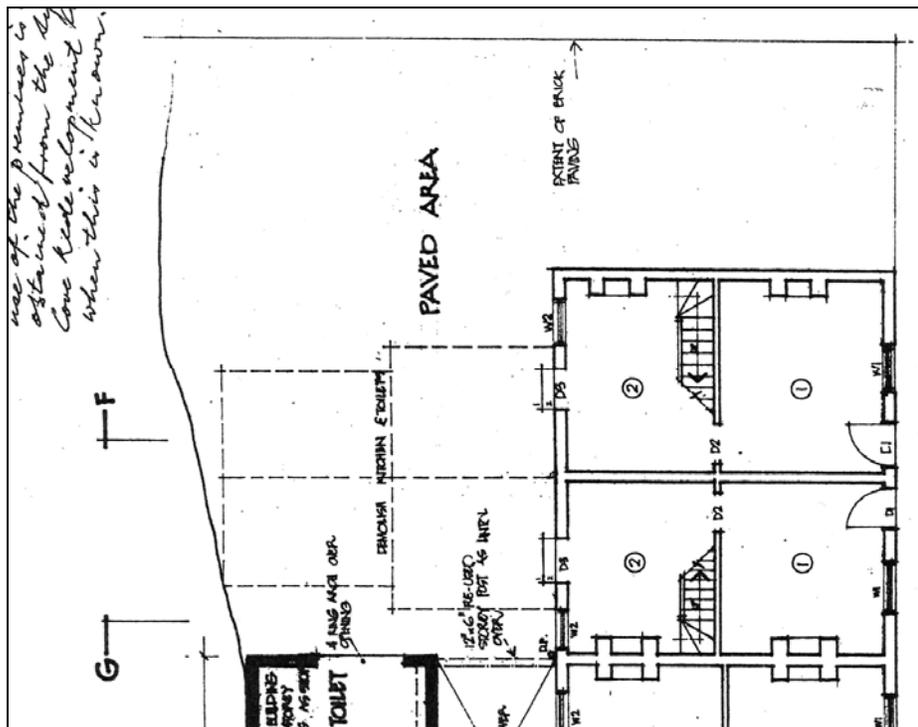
1971 Ground Floor Plan prepared by Fisher Jackson Hudson Architects showing the earlier configuration of the building. The outline of the rear wings and annexes are shown dotted. (Source: City Archives 1383/71)
